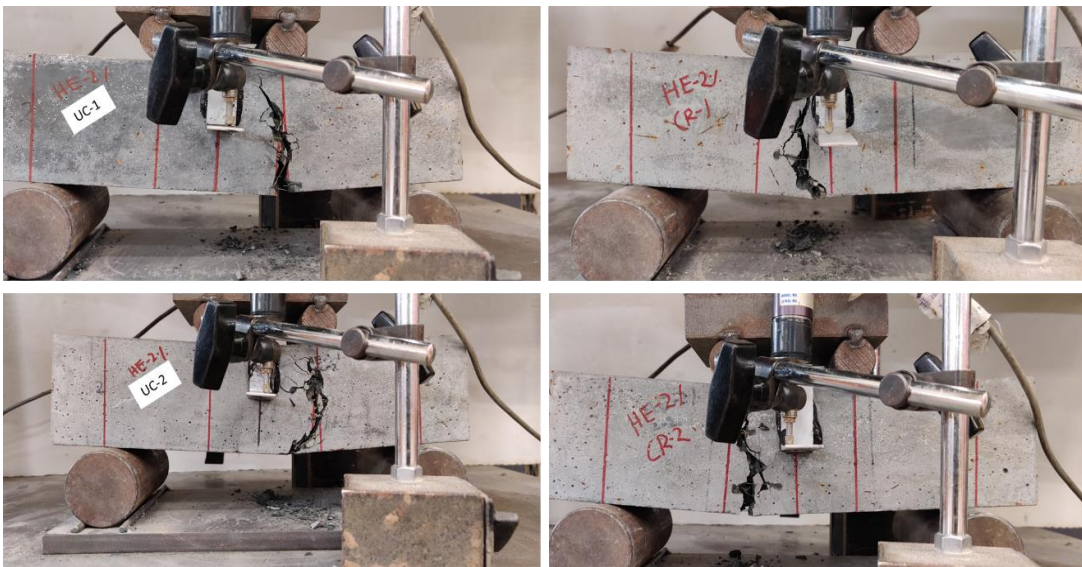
Cracks due to flexural testing for the HE-2% specimens exposed to rapid freezing and thawing.
